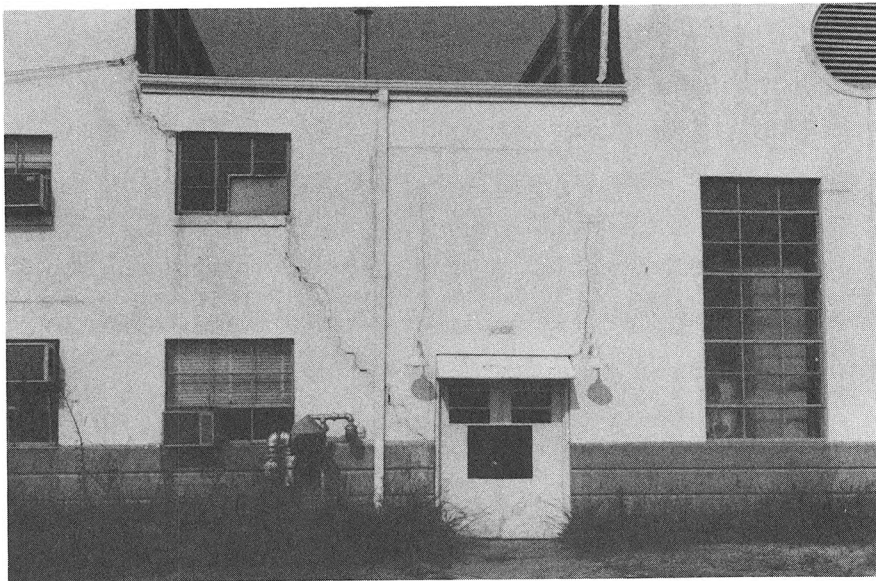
Examples of wall fractures from swelling foundation soils (after References 6, 30, 31)
